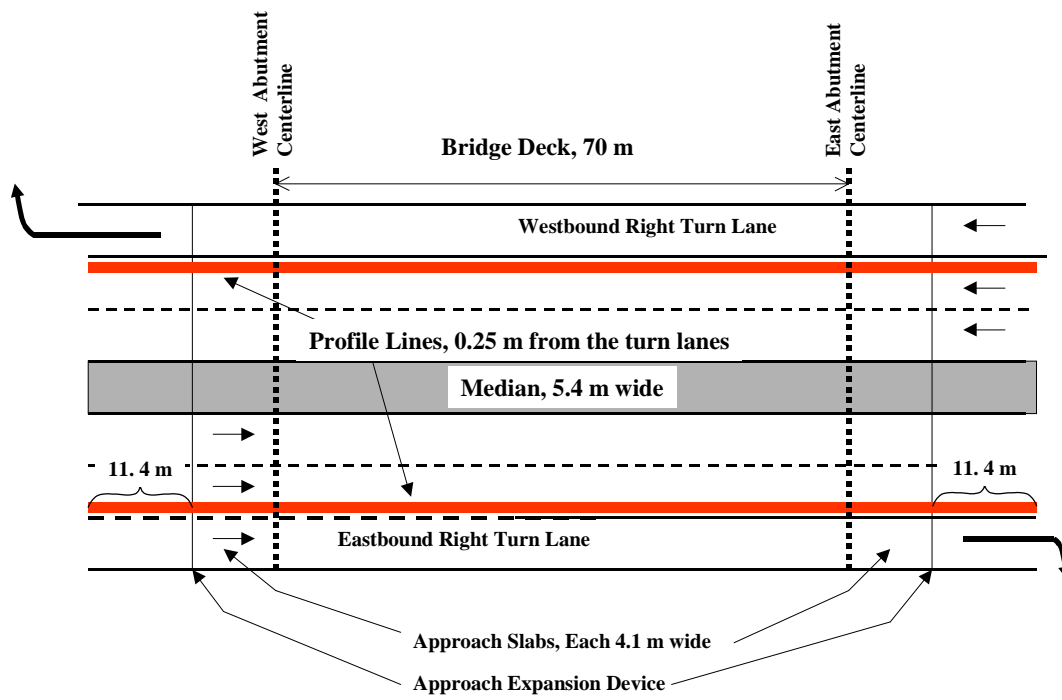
Locations of the Profiles Lines in the Founders/Meadows Bridge Structure.
